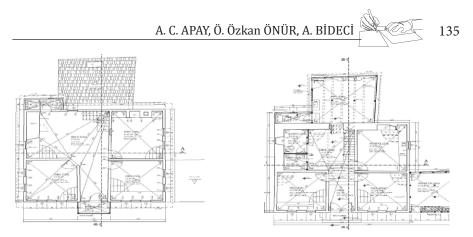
İbrahim Pilavcı House's ground floor plan and first floor plan
